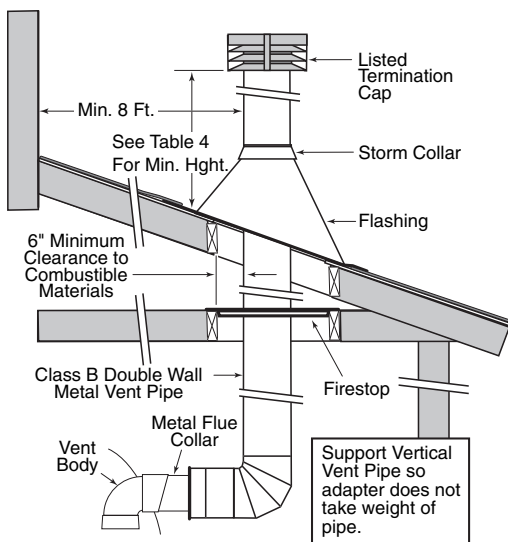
B: Typical Metal Vent Pipe installation-U.S. (Vertical – Negative Pressure)
